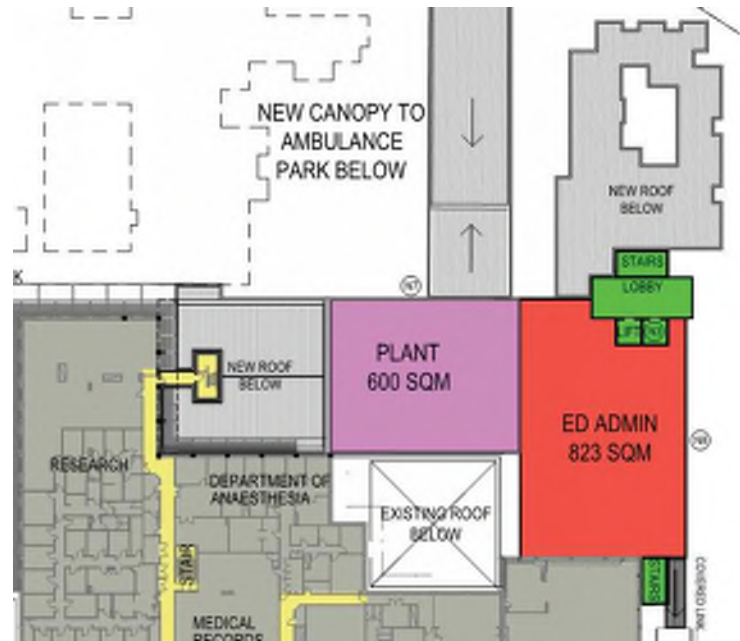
Concept Floor Plan – Level 1. NB – assessment based on new addition only (in red).
